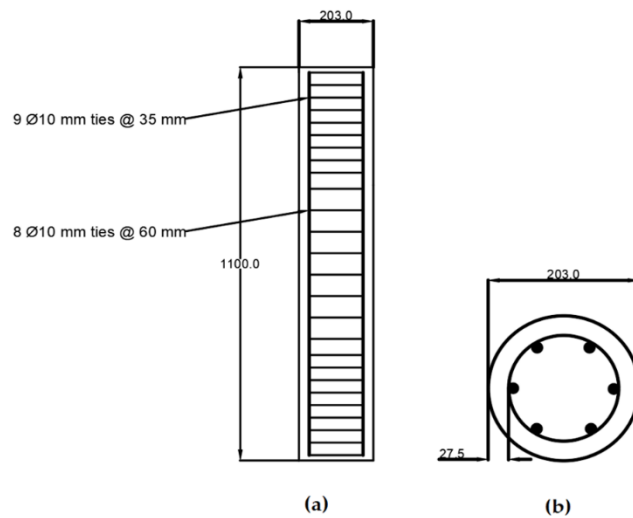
Circular FRP-RC column detail of 203 mm diameter (a) column dimension (b) cross section
